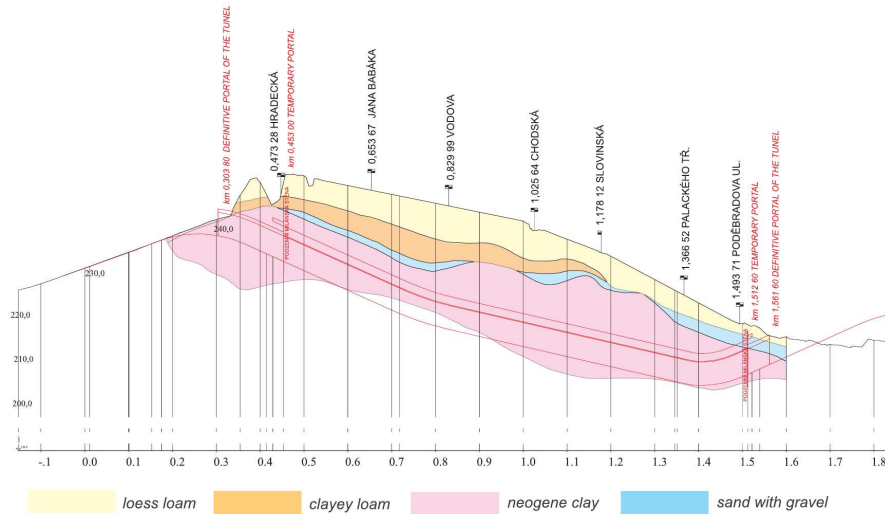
Longitudinal geological cross-section along the tunnels (Pavlík et al. [27]).
